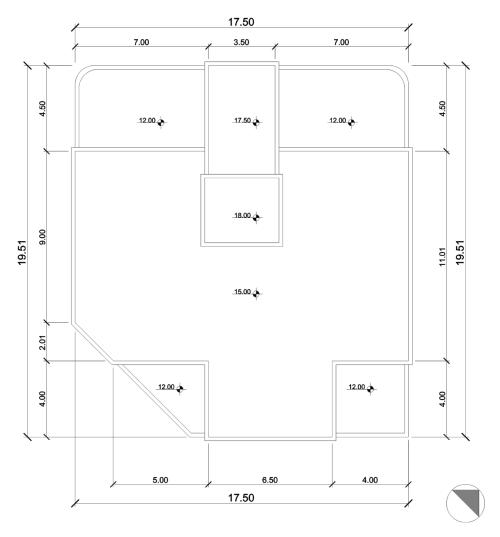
Top view plan of Döveç Apartment 20 Building (by Author).
